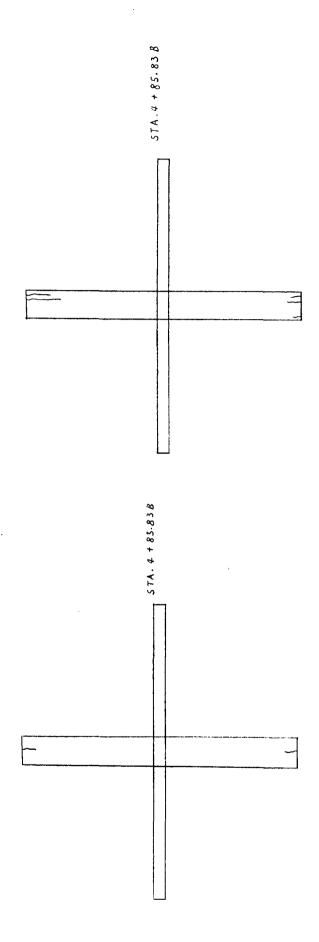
Surface cracking, bulkhead recesses, and land and river walls
